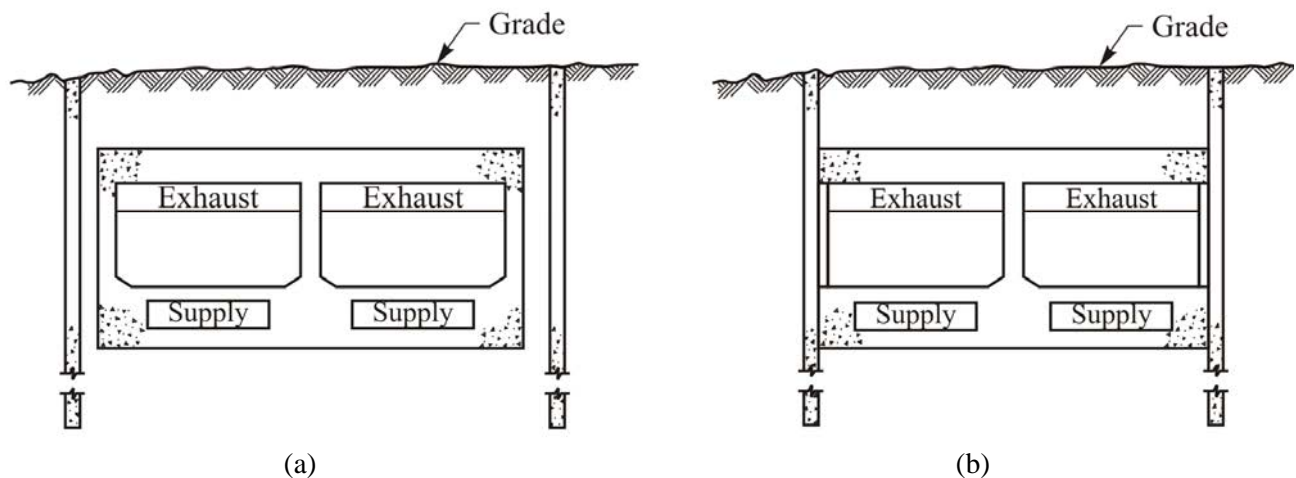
Cut and Cover Tunnel Bottom-Up Construction (a); Top-Down Construction (b)
